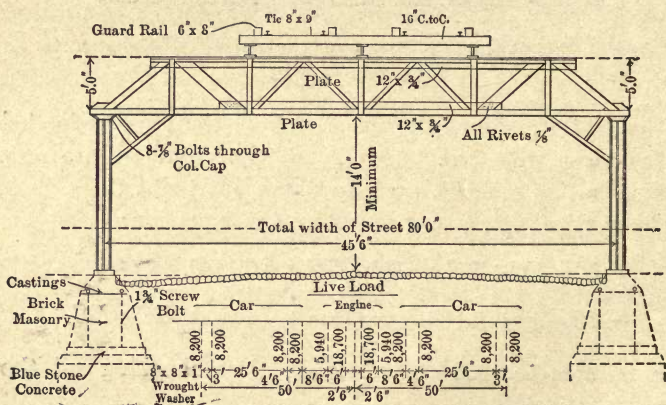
Elevated Railway, Brooklyn, N. Y.
